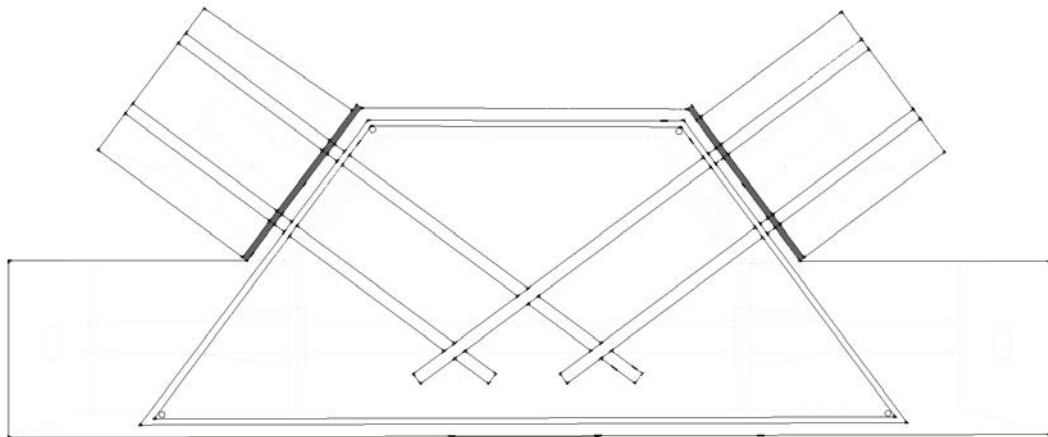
Conventional reinforced joint, the bars will be anchored with U-shaped hairpins
